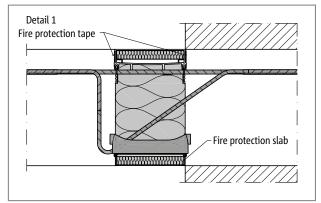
Schöck Isokorb® XT type K with REI120: Detail 1
